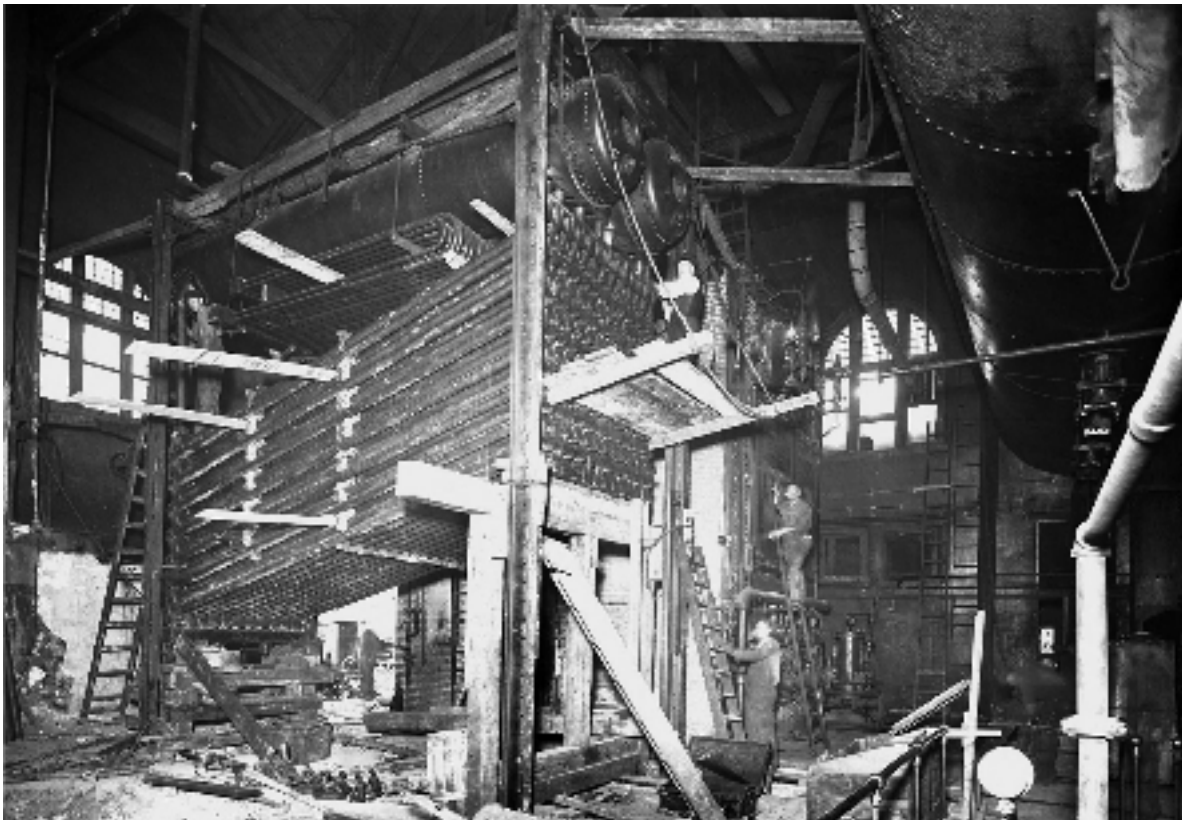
Interior of the Boiler House, January 23, 1919, looking southeast, showing one of the boilers stripped of its enclosing brick foundation (Historic Pittsburgh).
